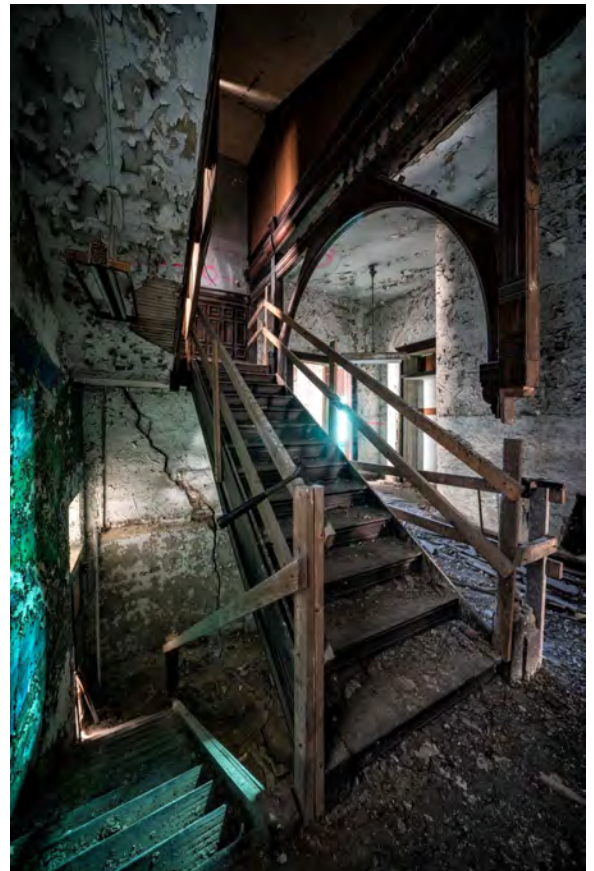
Warden's Residence interior, public staircase, looking southwest, showing the loss of many elements of historic wood trim. The flight of stairs at left led down to the finished ground floor level and the hall that would have welcomed visitors entering from the porte cochere. In the distance (through the wooden arch) can be seen what was originally the reception room.
